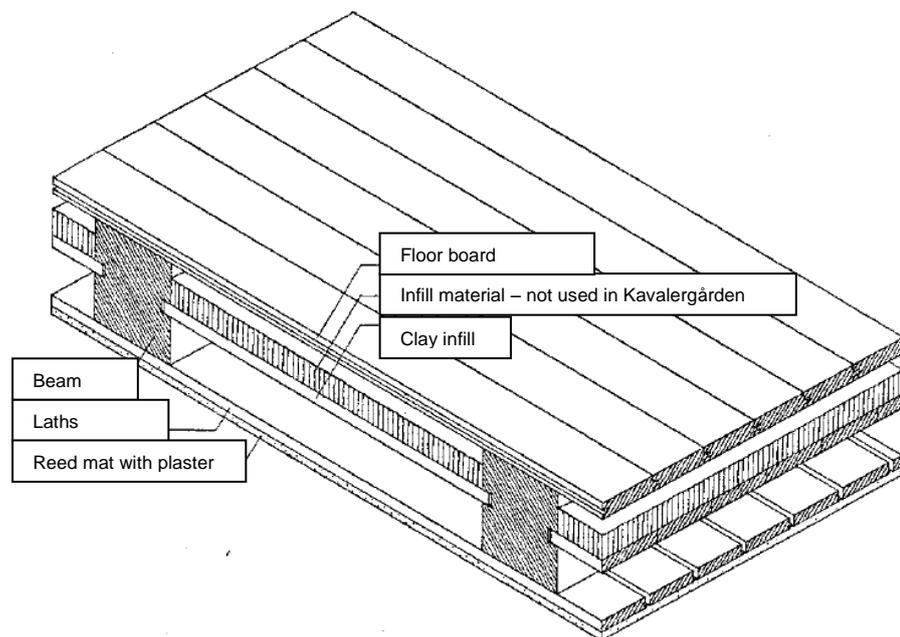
Isometric illustration of a horizontal division - timber beams with infill material and clay infill. In Kavalergården the timber beam layers are made without clay infill (although it is shown above).
